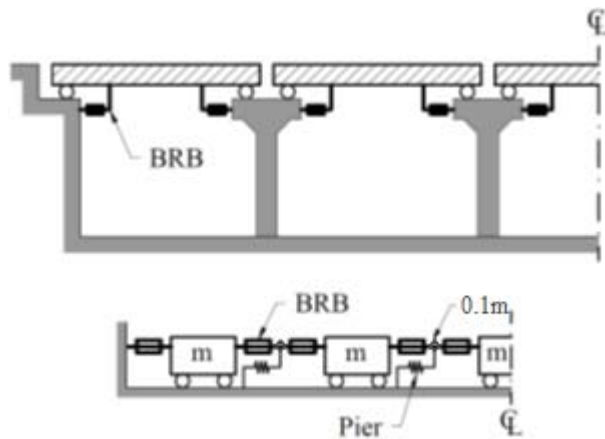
Model with BRBs connecting spans to piers and abutment.
